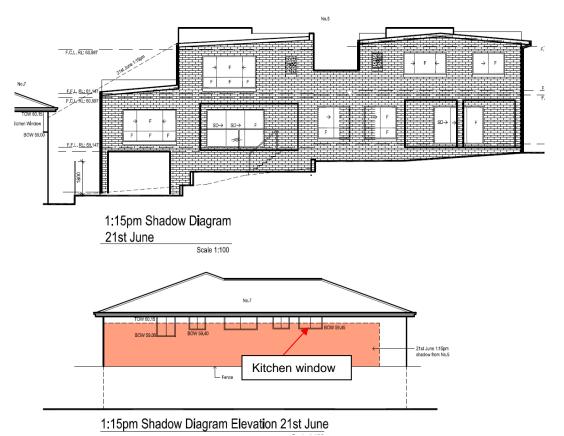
Elevational shadow diagrams assessing impact on No. 7 Farnell Street
